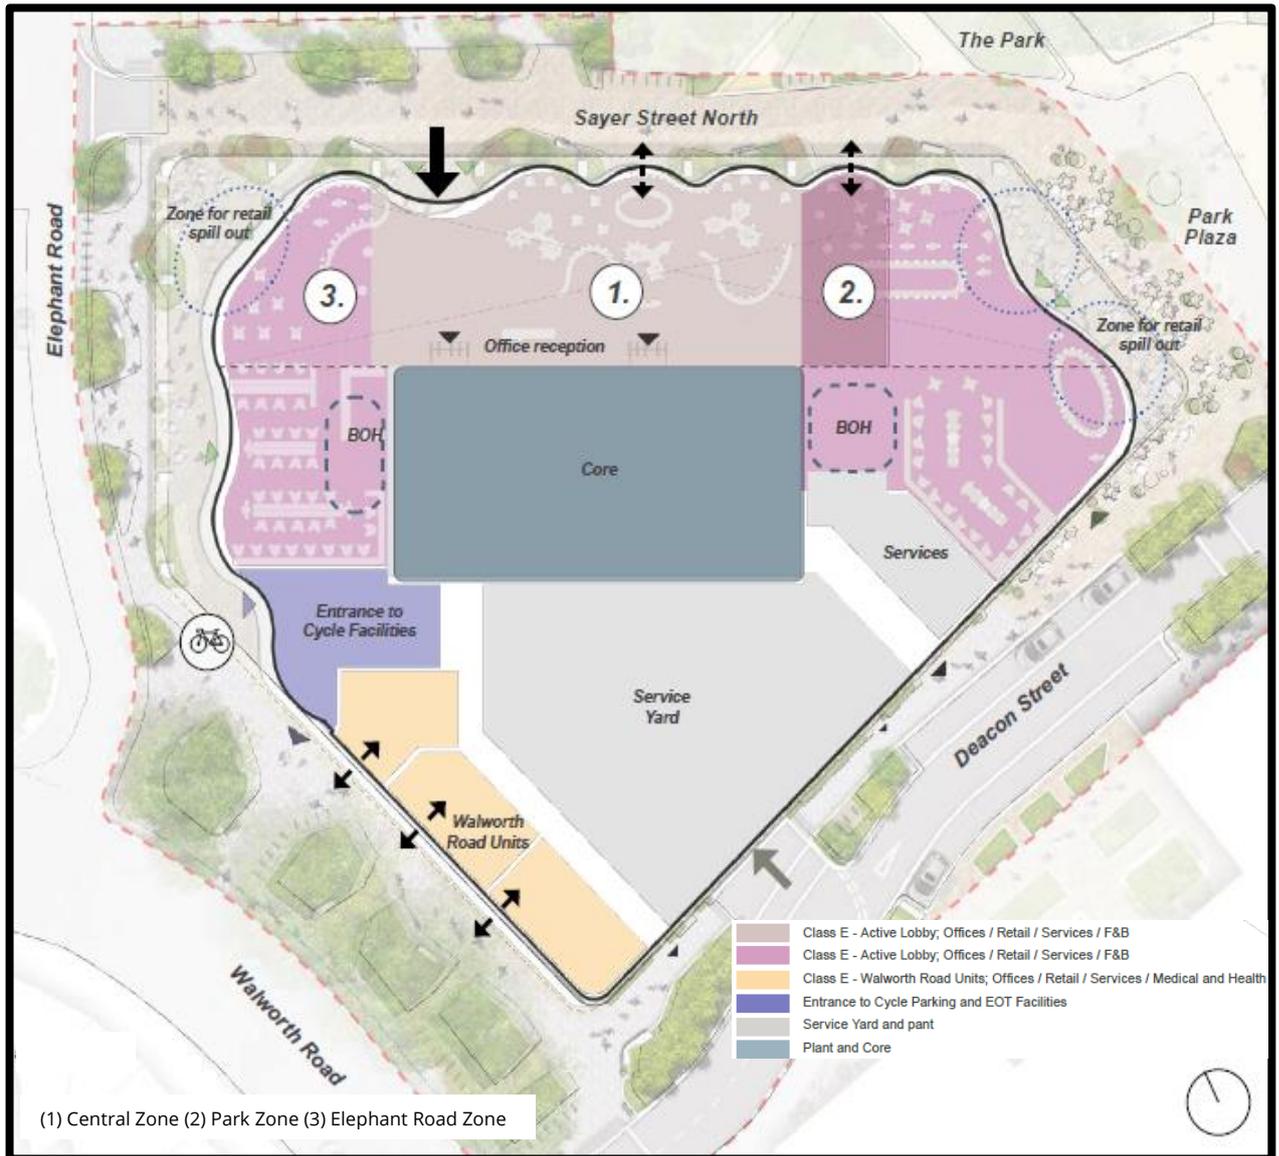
Ground Floor Layout of the H1 Development (Source: Modified from ACME)
